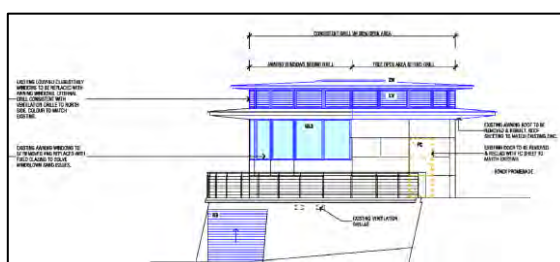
Proposed modifications to beach elevation of Lifeguard Tower, Tunnel 2 and Amenities block.
